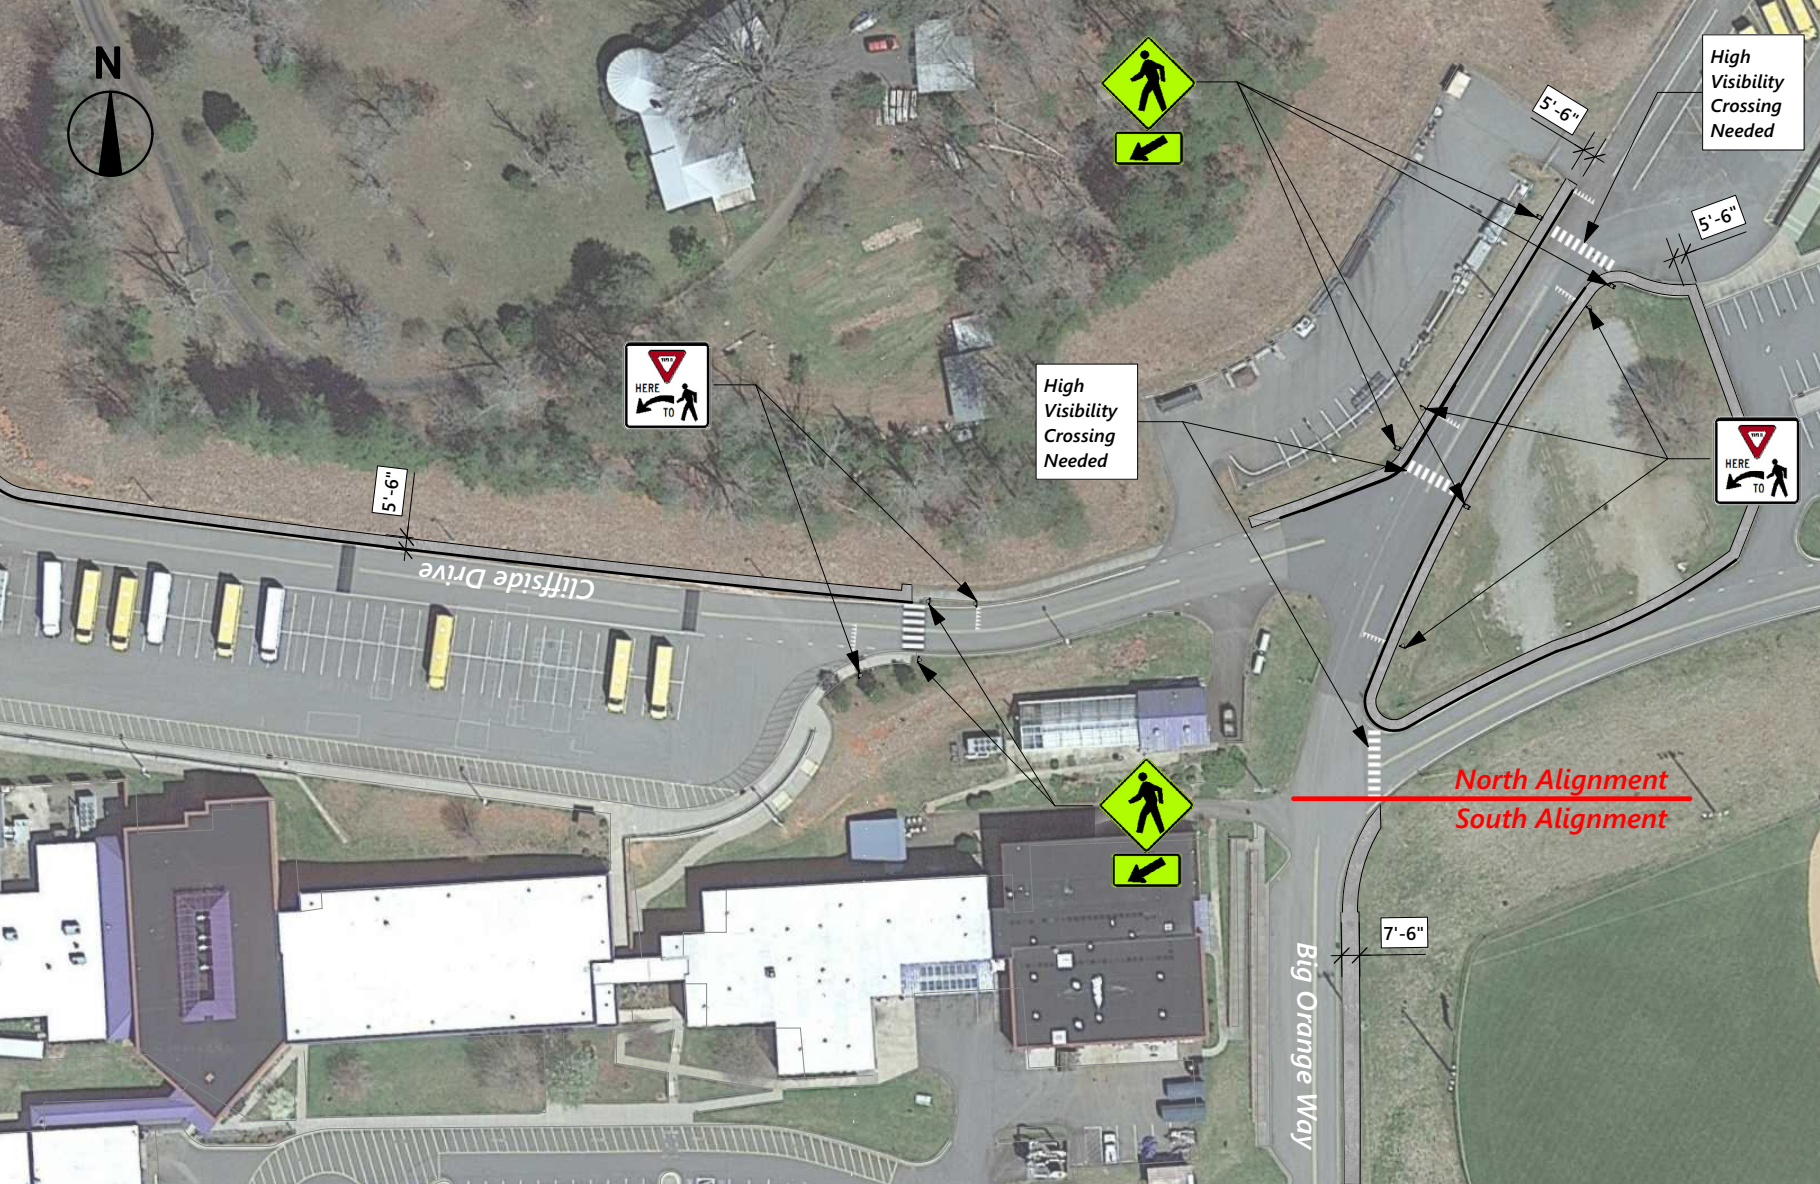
Pedestrian Connection Concept Plan (Paved Trail)
